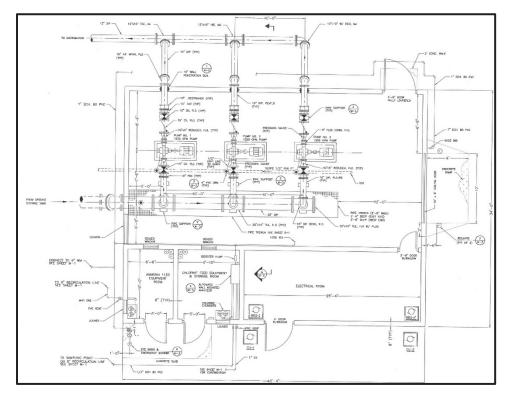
Project Prairie Water Storage and Booster Pump Station System Booster Pump Station Plan (Source: TetraTech Record Drawings, July 2006)
